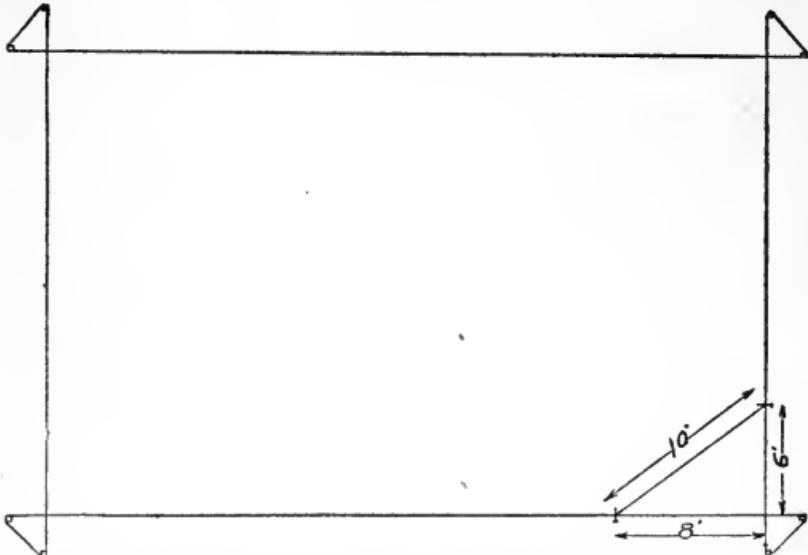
Diagram Showing How to Stake the Foundation of a Farm Building so the Excavation Can Be Made Clear Out to the Corners without Undermining the Stakes
